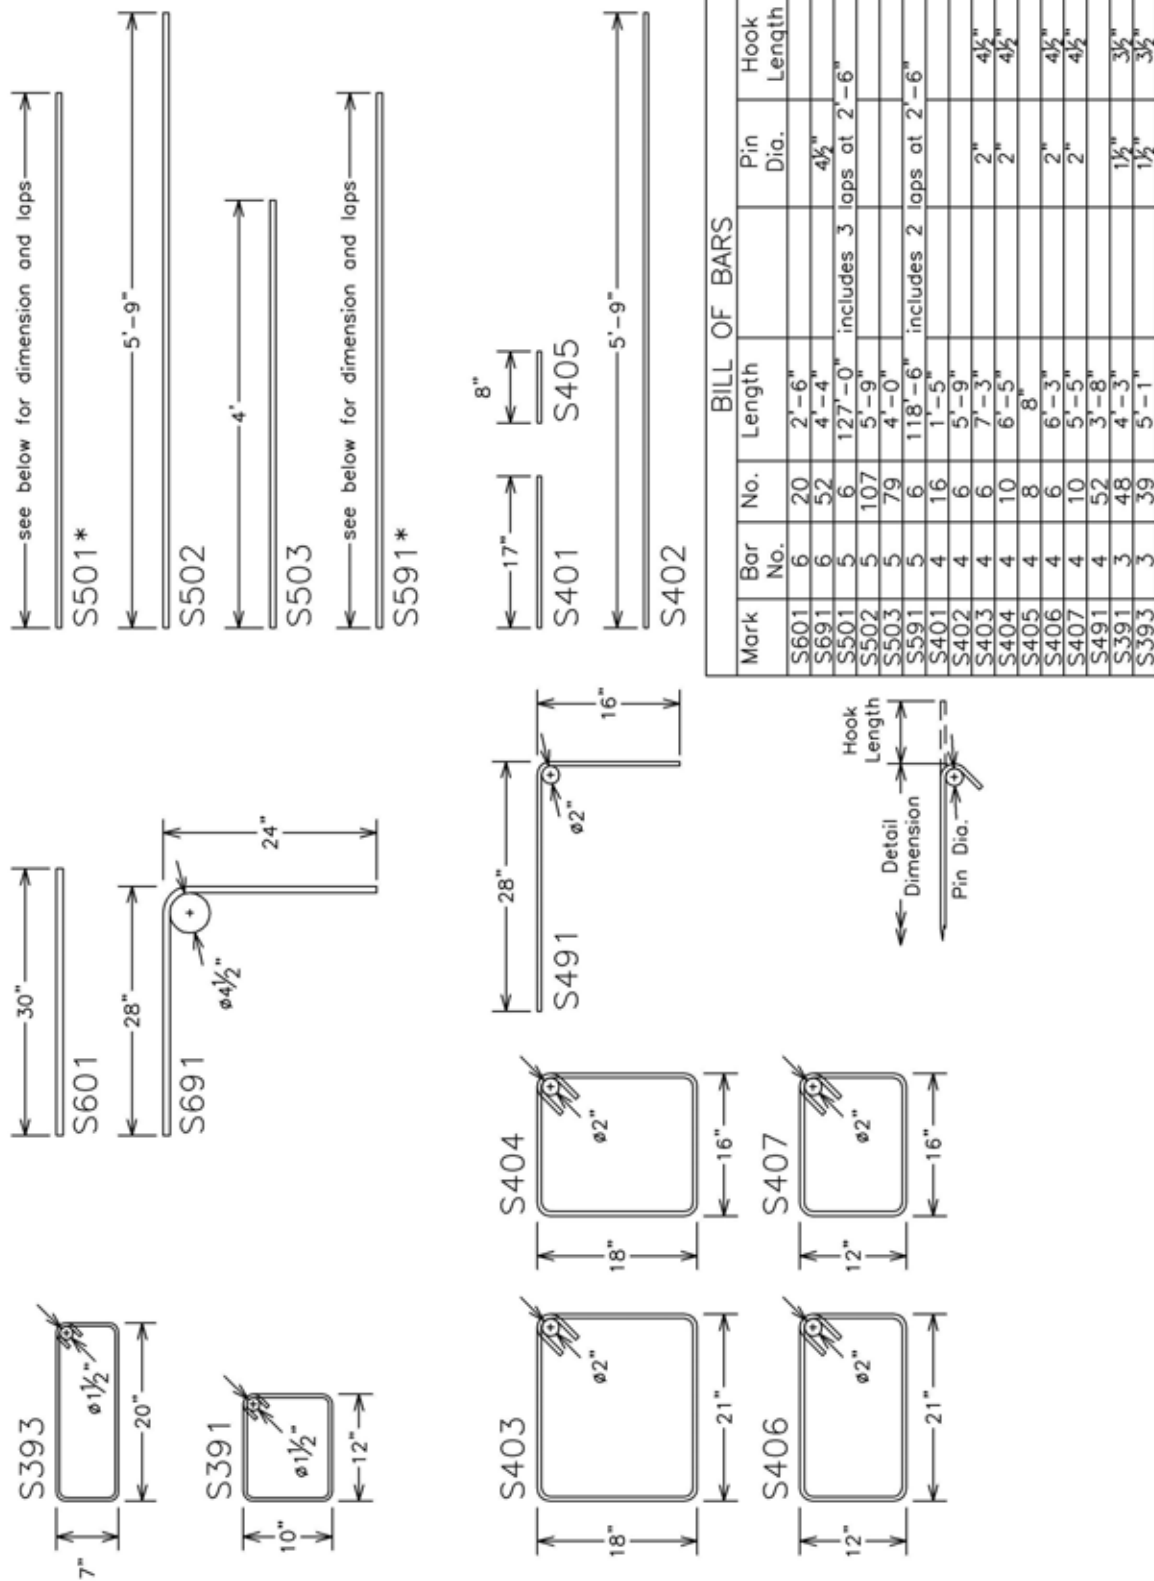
OCR Bridge Rail on Inverted Tee Bridge Deck Bill of Bars (English)
